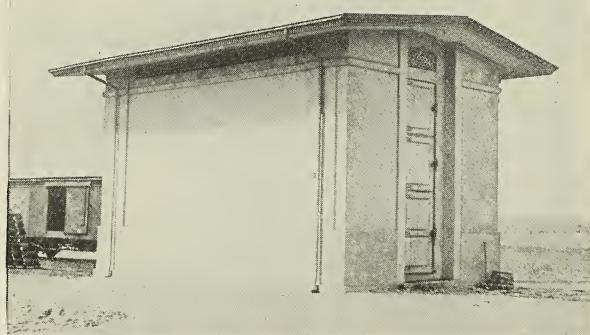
Ice House with Concrete Roof, Armour Farm, Lake Forest, Ill. A practical structure of pleasing appearance and permanent construction.
